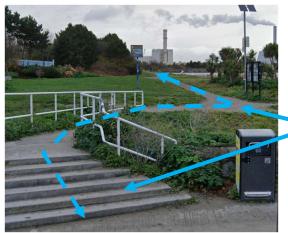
Excerpt from the applicant drawings showing the <u>possible</u> future upgrading of the existing footpath from the site to Beach Road and along Sandymount Strand (Source: Dwg. No. CP1901_3FM-RPS_S26-PGN-XX-DR-HE-100-0005)
